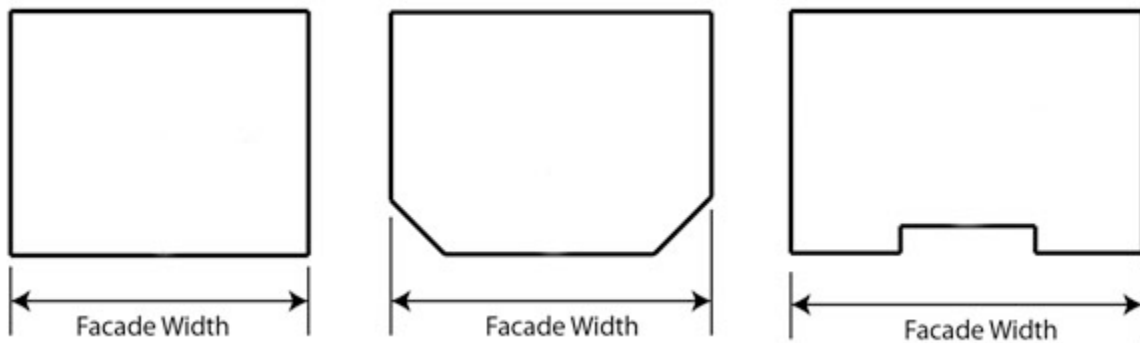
Illustration of façade width measurement on varied façade shapes.
